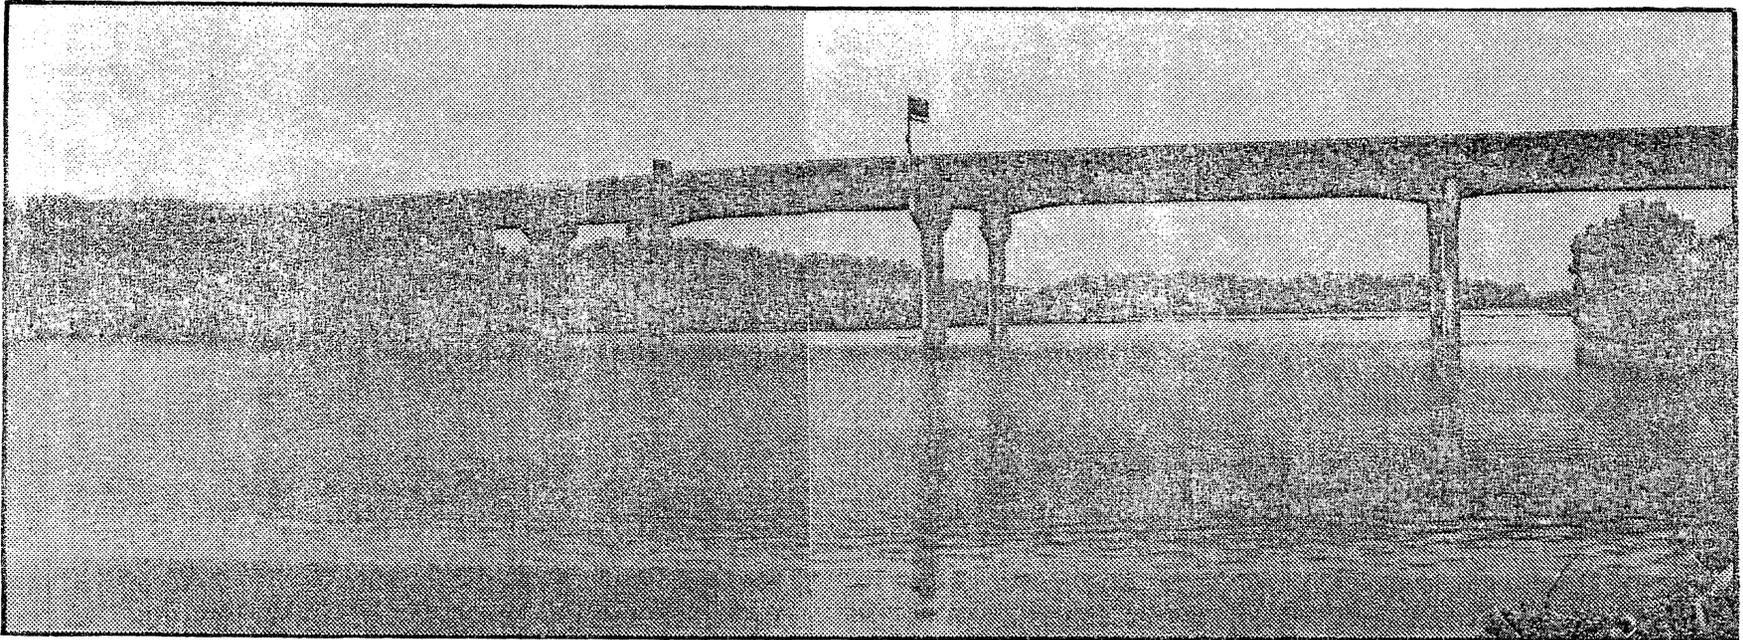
Looking upstream at R.M. 15 towards the I-435 bridge
